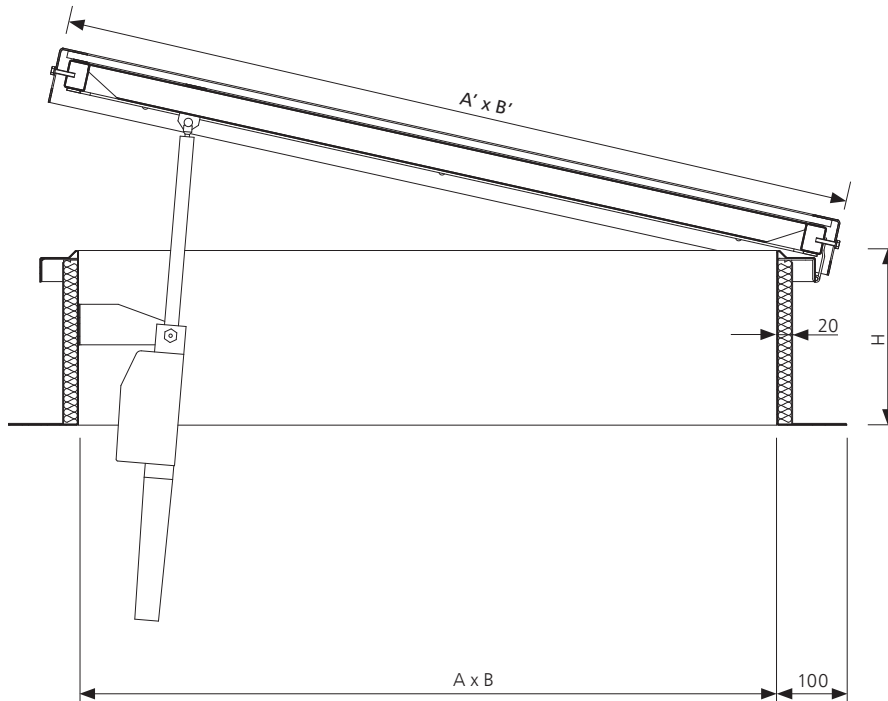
Section B-B of mcr PROLIGHT E ventilation vent in open position, dimensions in [mm]
